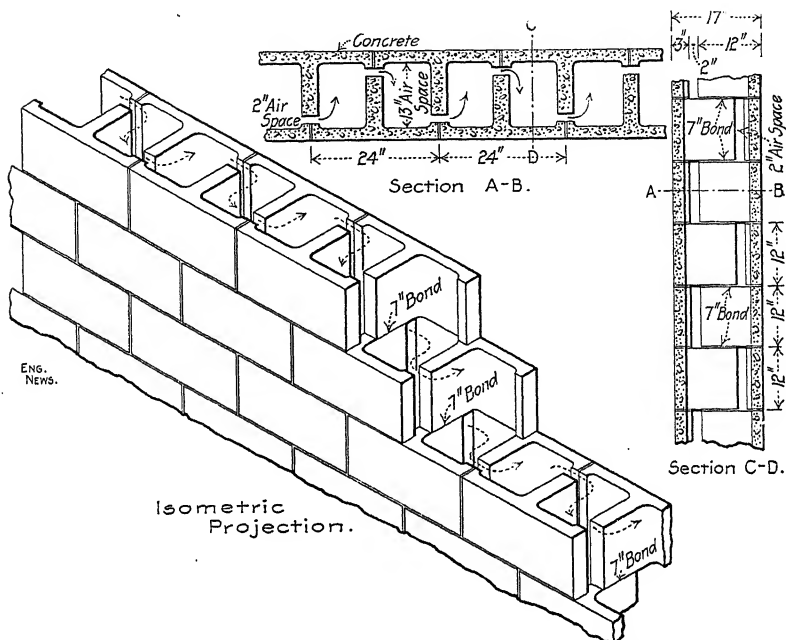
PLATE X. Illustrating Continuous Horizontal Air Space in Wall Built on American Hydraulic Stone Co.'s System.
